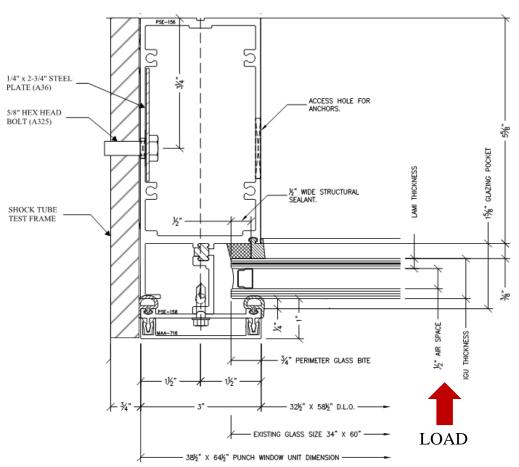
Typical Shock Tube Window Connection: IGU Layup
